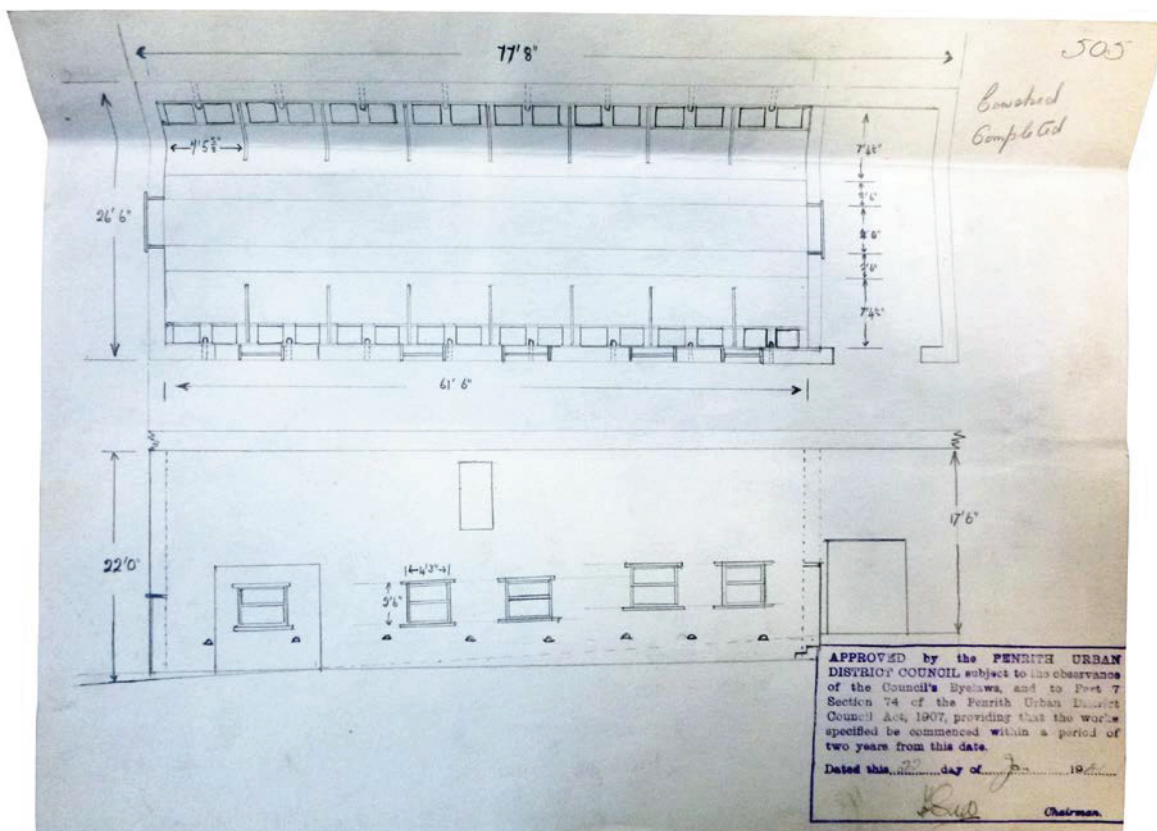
Plan and elevation of the proposed cowshed at White Ox Farm, 1941
